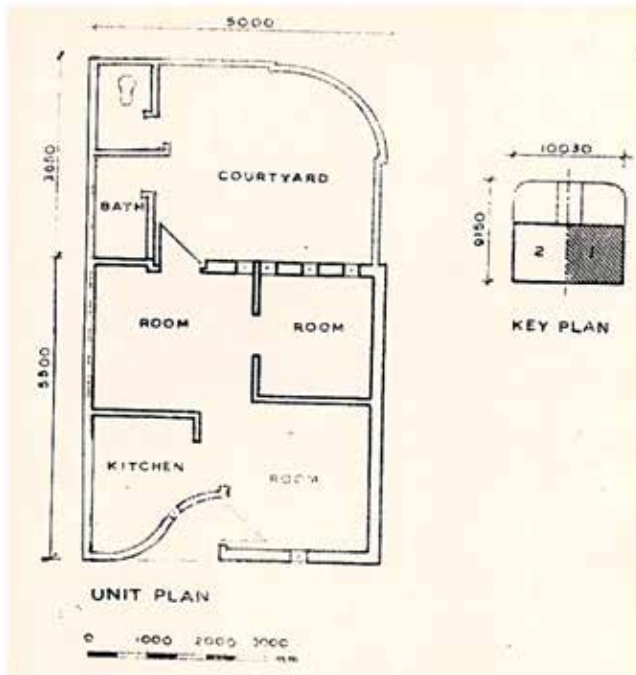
A 27.5 sqm House with rat trap bond brick wall, burnt brick paving, frameless doors and windows, no plastering and brick shell roof, Architect Laurie Baker
